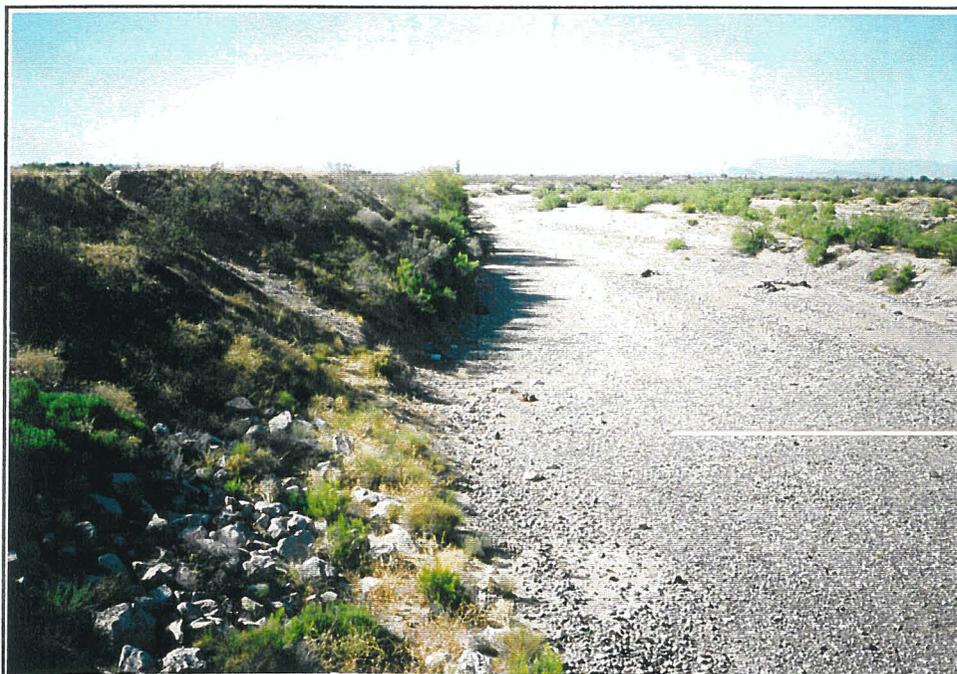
View of west bank of main channel looking upstream from bridge deck. Note placement of rip-rap upstream of west abutment to control lateral migration of primary low flow channel.
